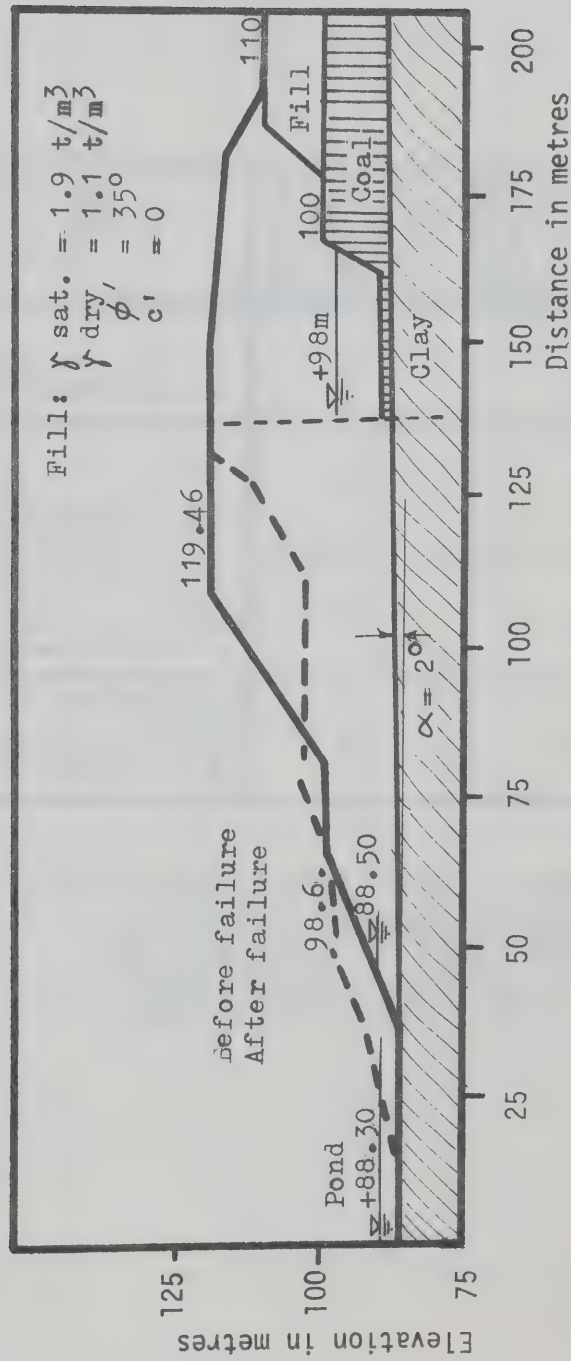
FAILURE IN AN OPEN PIT MINE, GERMANY, 1966
